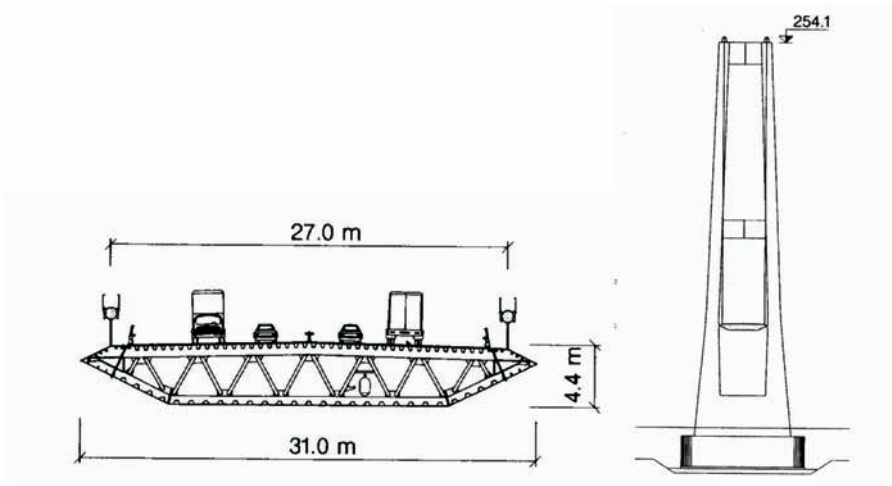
Cross sections and general view of the Great Belt Bridge.
